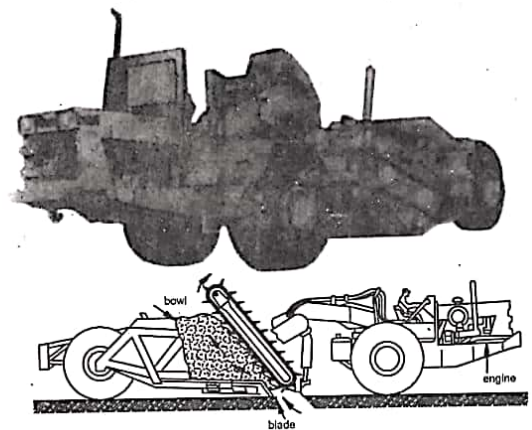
A scraper showing the bowl (a cutaway view) getting loaded.
